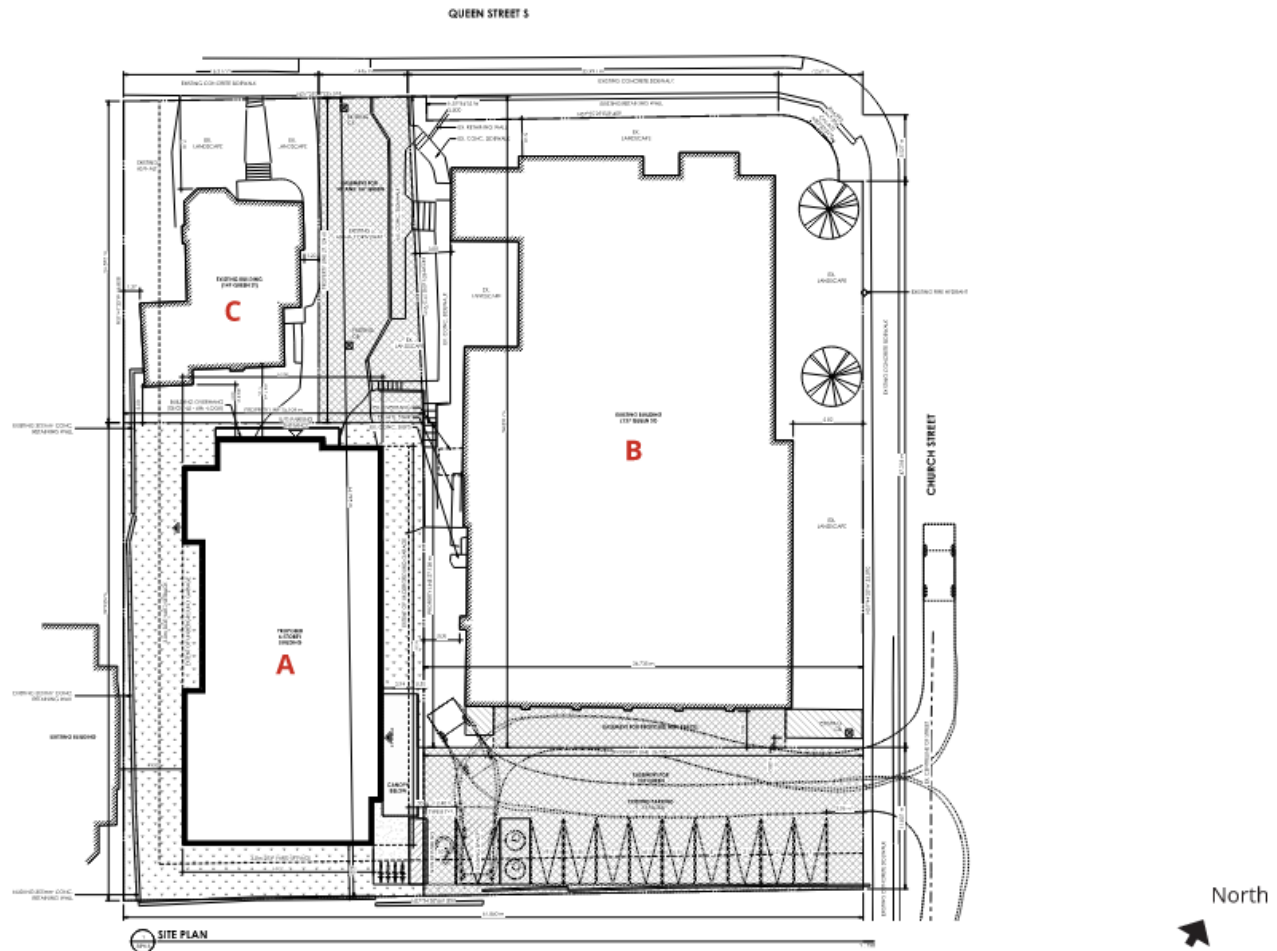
Proposed Site Plan for the development at 137 Queen Street South. Building 'A' is the proposed 6-storey affordable housing project.
